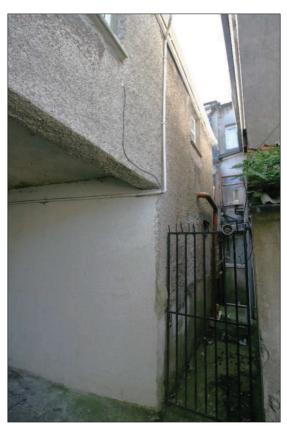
Rear, north elevation of subject property looking towards rear of properties fronting onto Gladstone Street
